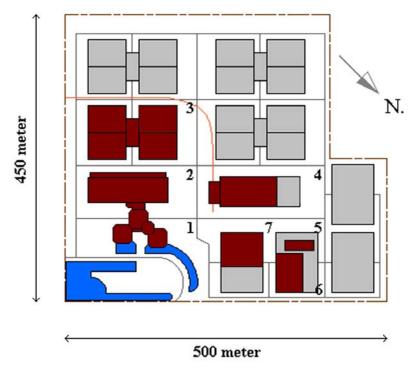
Lay-out of the COVRA facilities in 2008 (In grey future expansions of the modular buildings are indicated)
